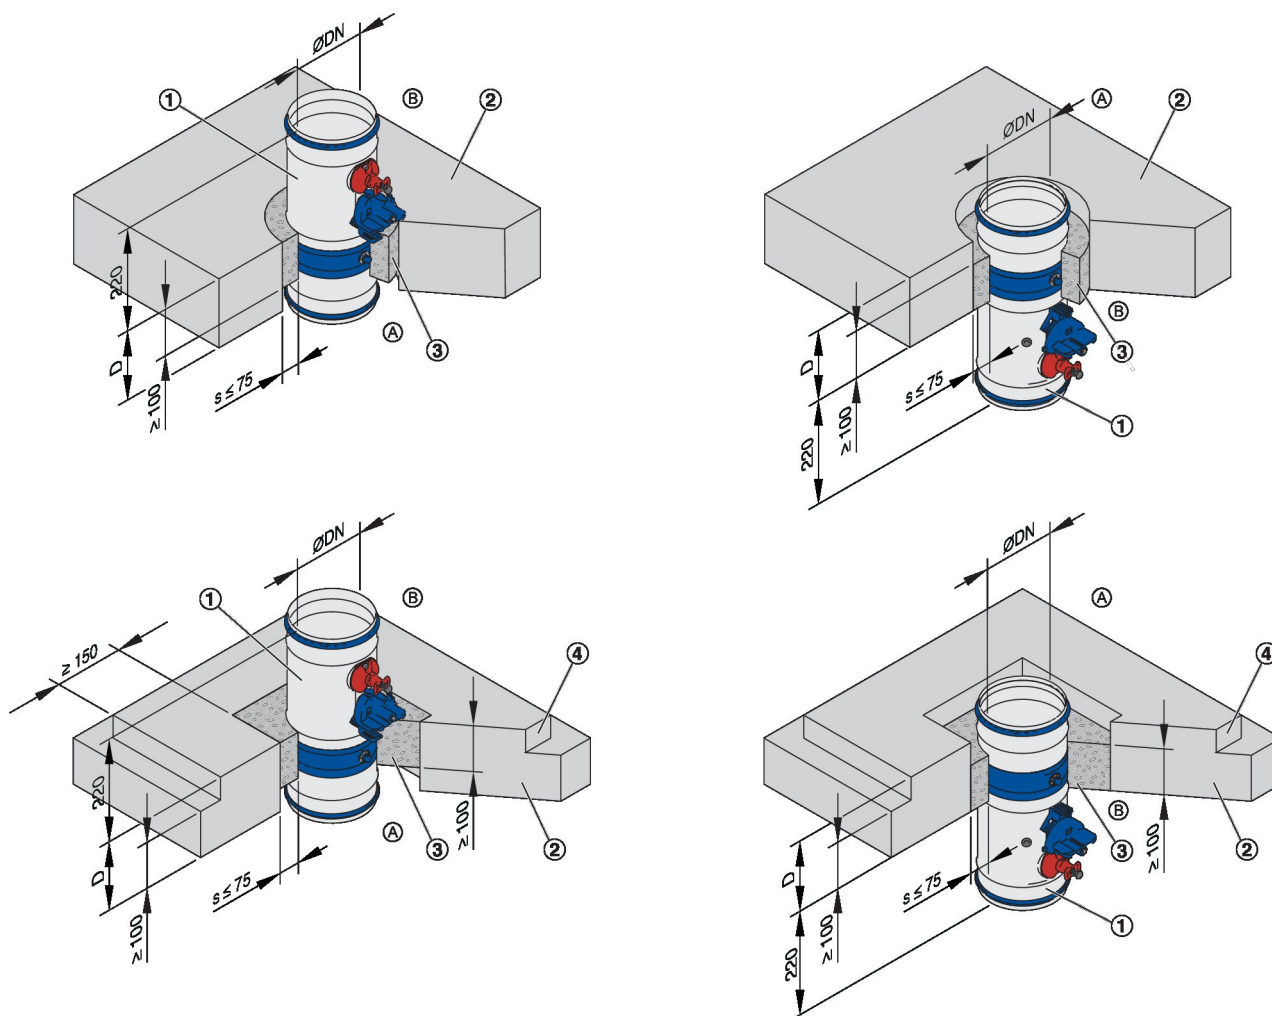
Mortar-based installation into solid ceiling slab, suspended or upright
